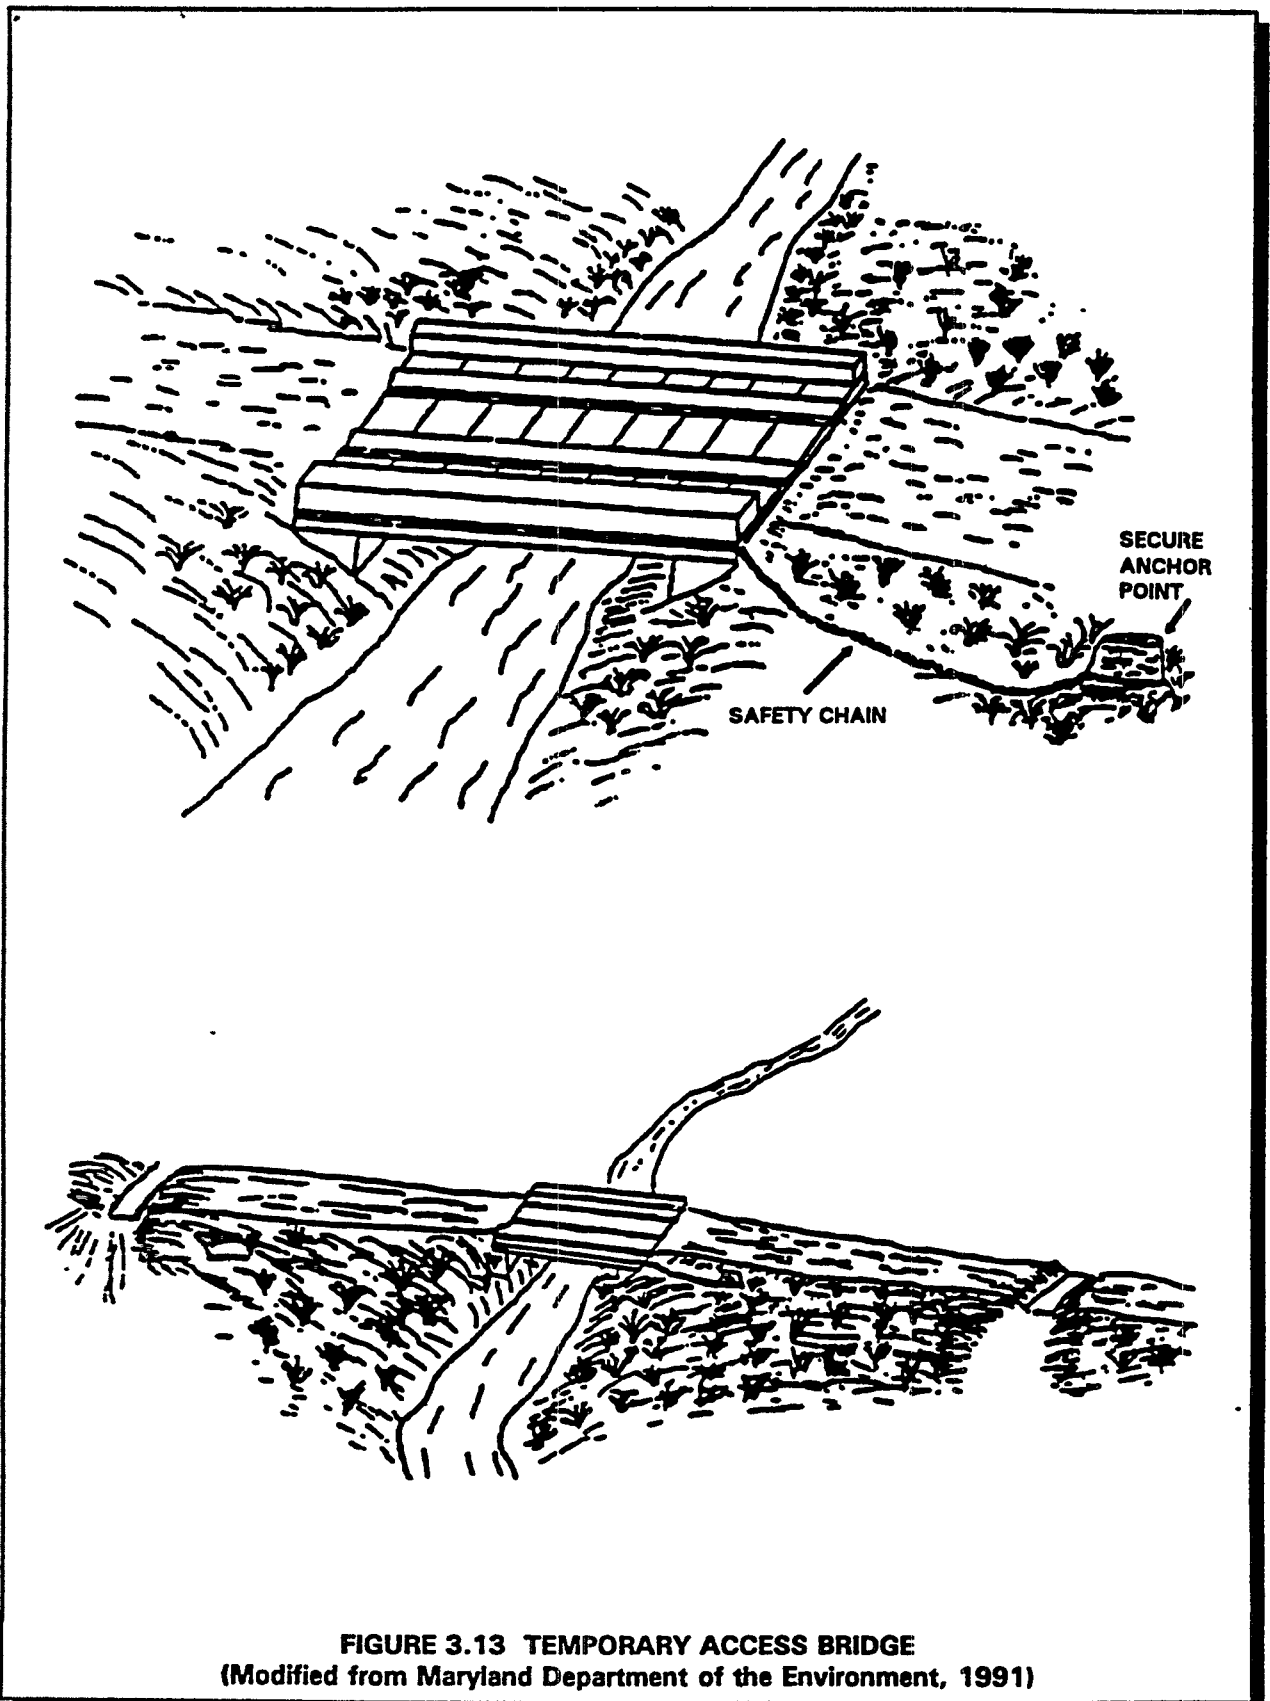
TEMPORARY ACCESS BRIDGE
